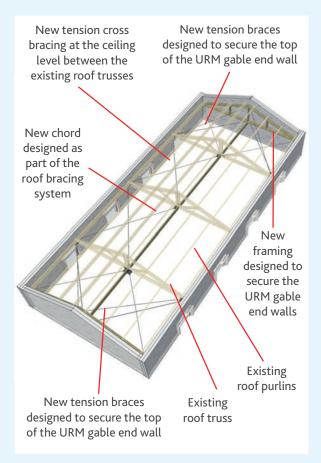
Example of roof diaphragm retrofit with tension braces.
